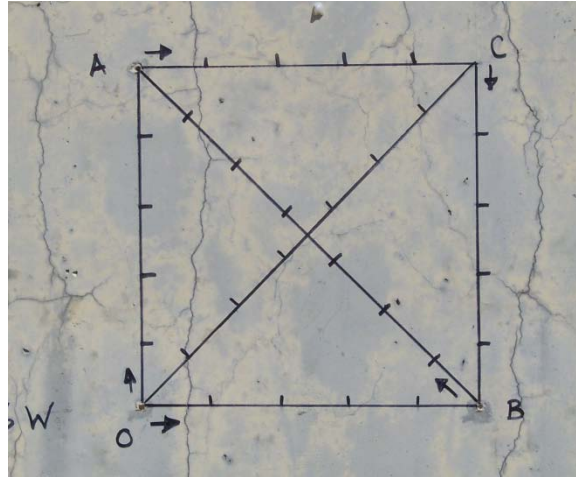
Extensive cracking evident on the West face of Column 36, possibly caused by early-age thermal cracking, followed by ASR.
